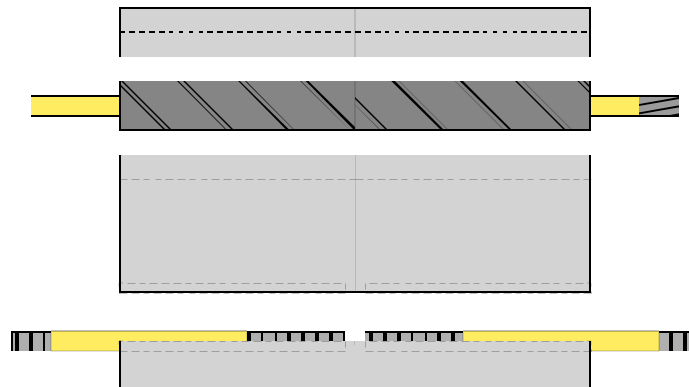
Specimen Opened to Expose Mild Steel Bars.
